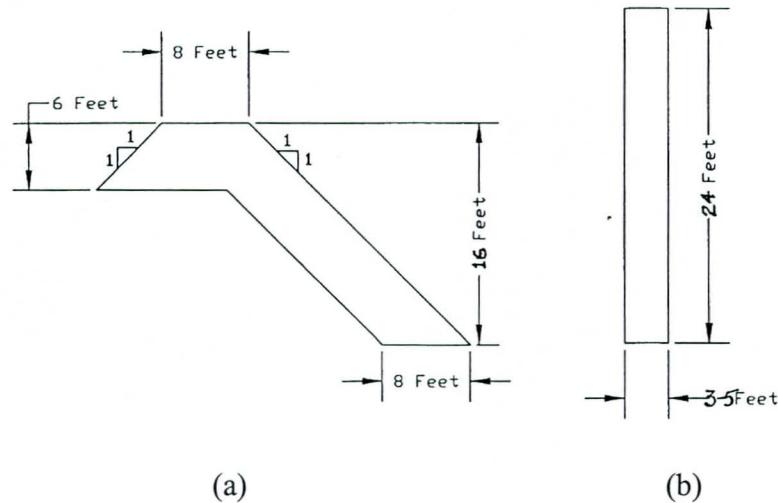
Typical guide dike cross sections for (a) soil cement construction and (b) slurry-wall construction.
